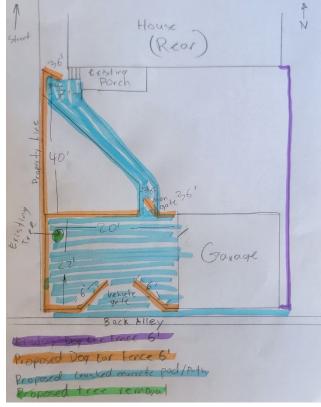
, by Applicant: Proposed installation of the gravel pad and walkway, fence, and tree removal.
